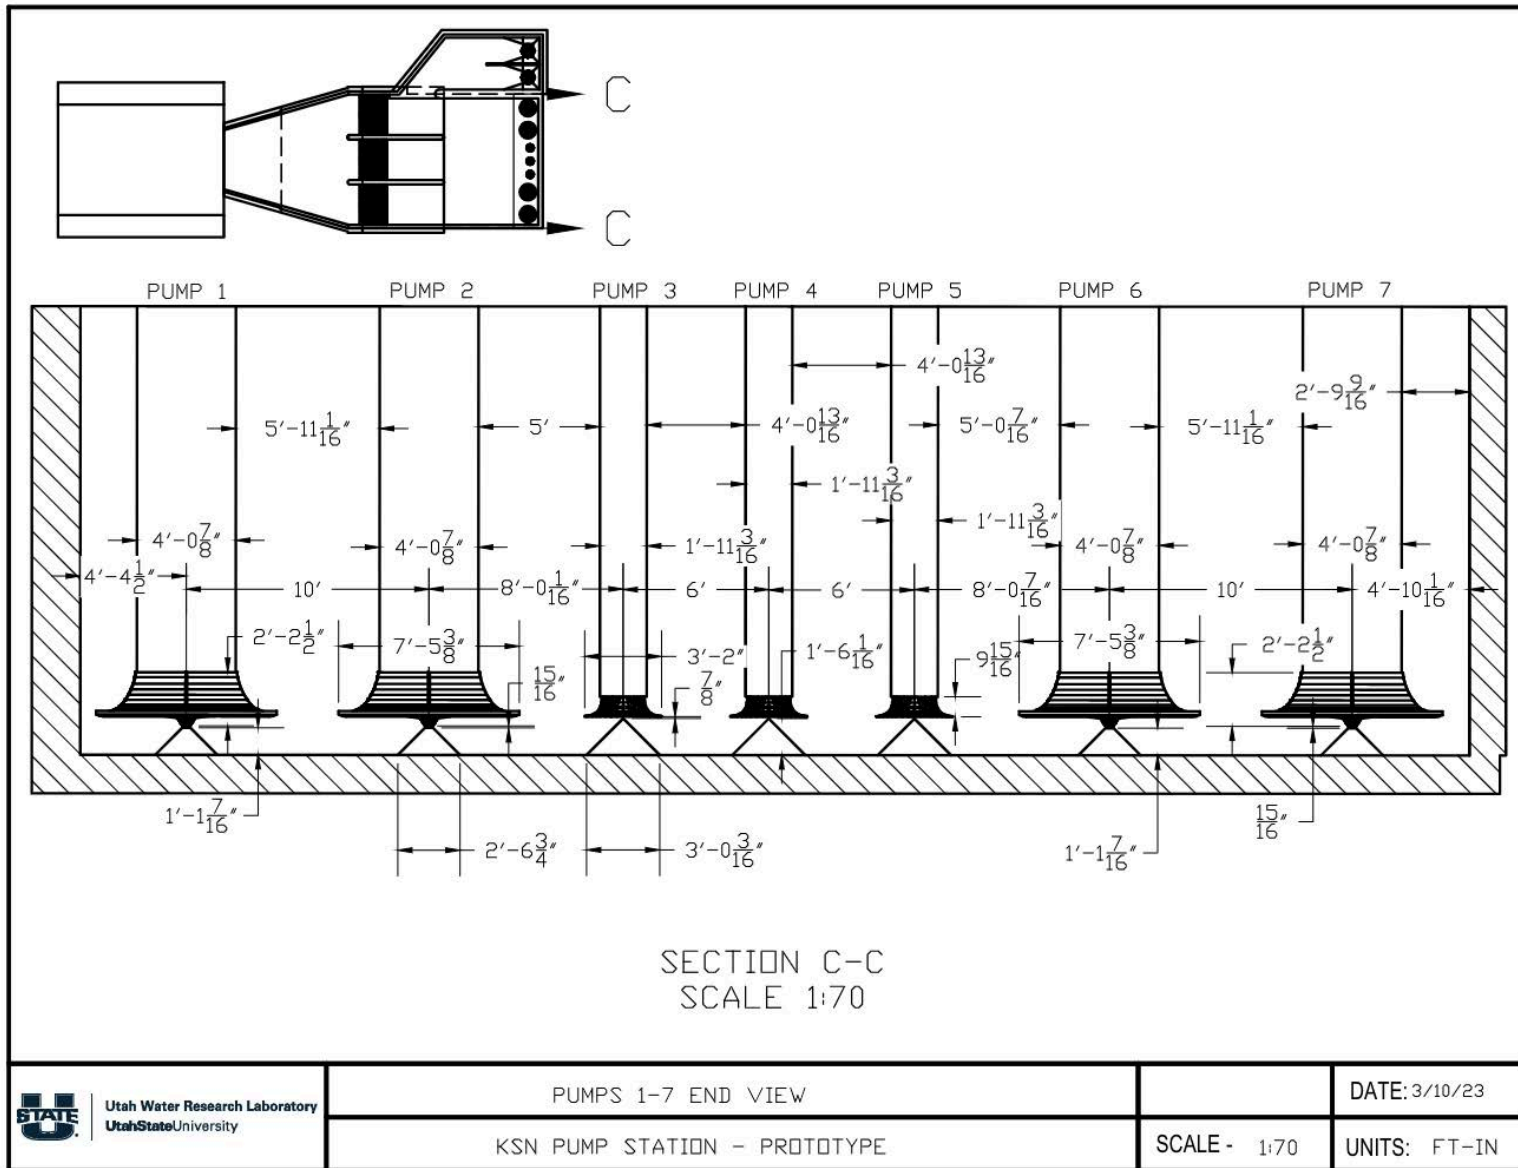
Final fix configuration for pumps 1 through 7 (end view prototype dimensions)
